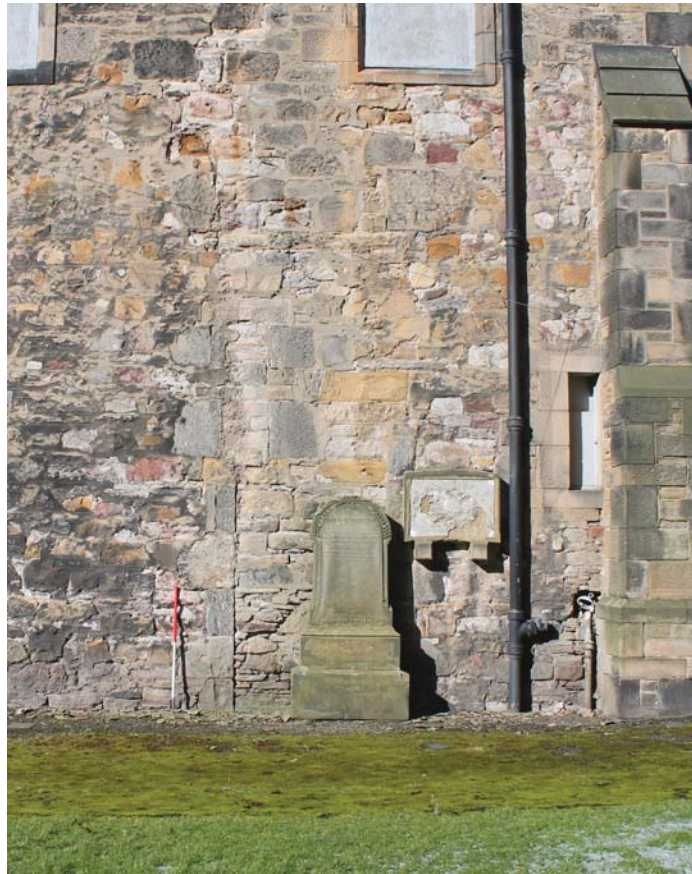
South-east elevation, detail of the blocked opening to the north-east side from the south-east
